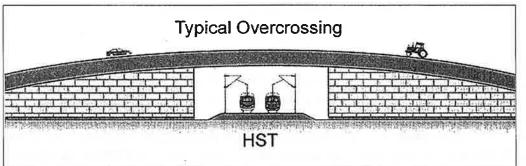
Typical Cross Section of a Roadway Overcrossing the HST
